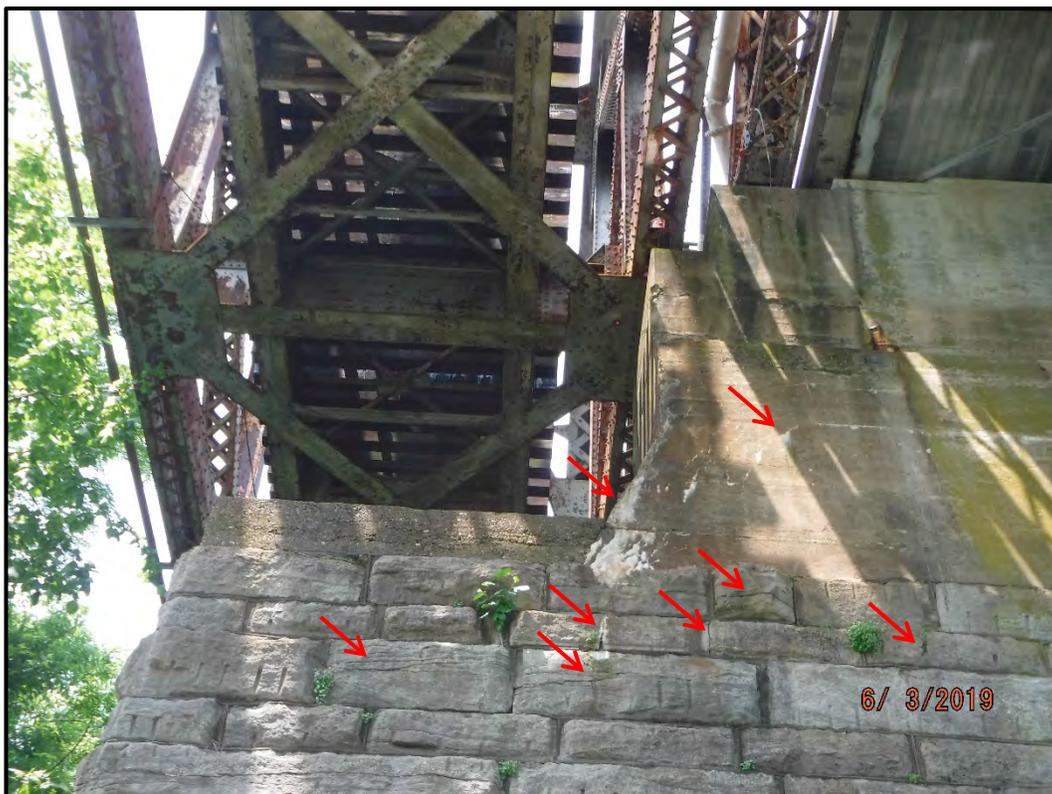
Minor cracking throughout the south end of the Pier 6 east face. Note the deterioration of the cap concrete and the heavy efflorescence.
